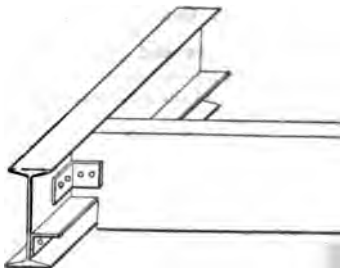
Wooden Beam Framed to I Beam with Shelf-angle
